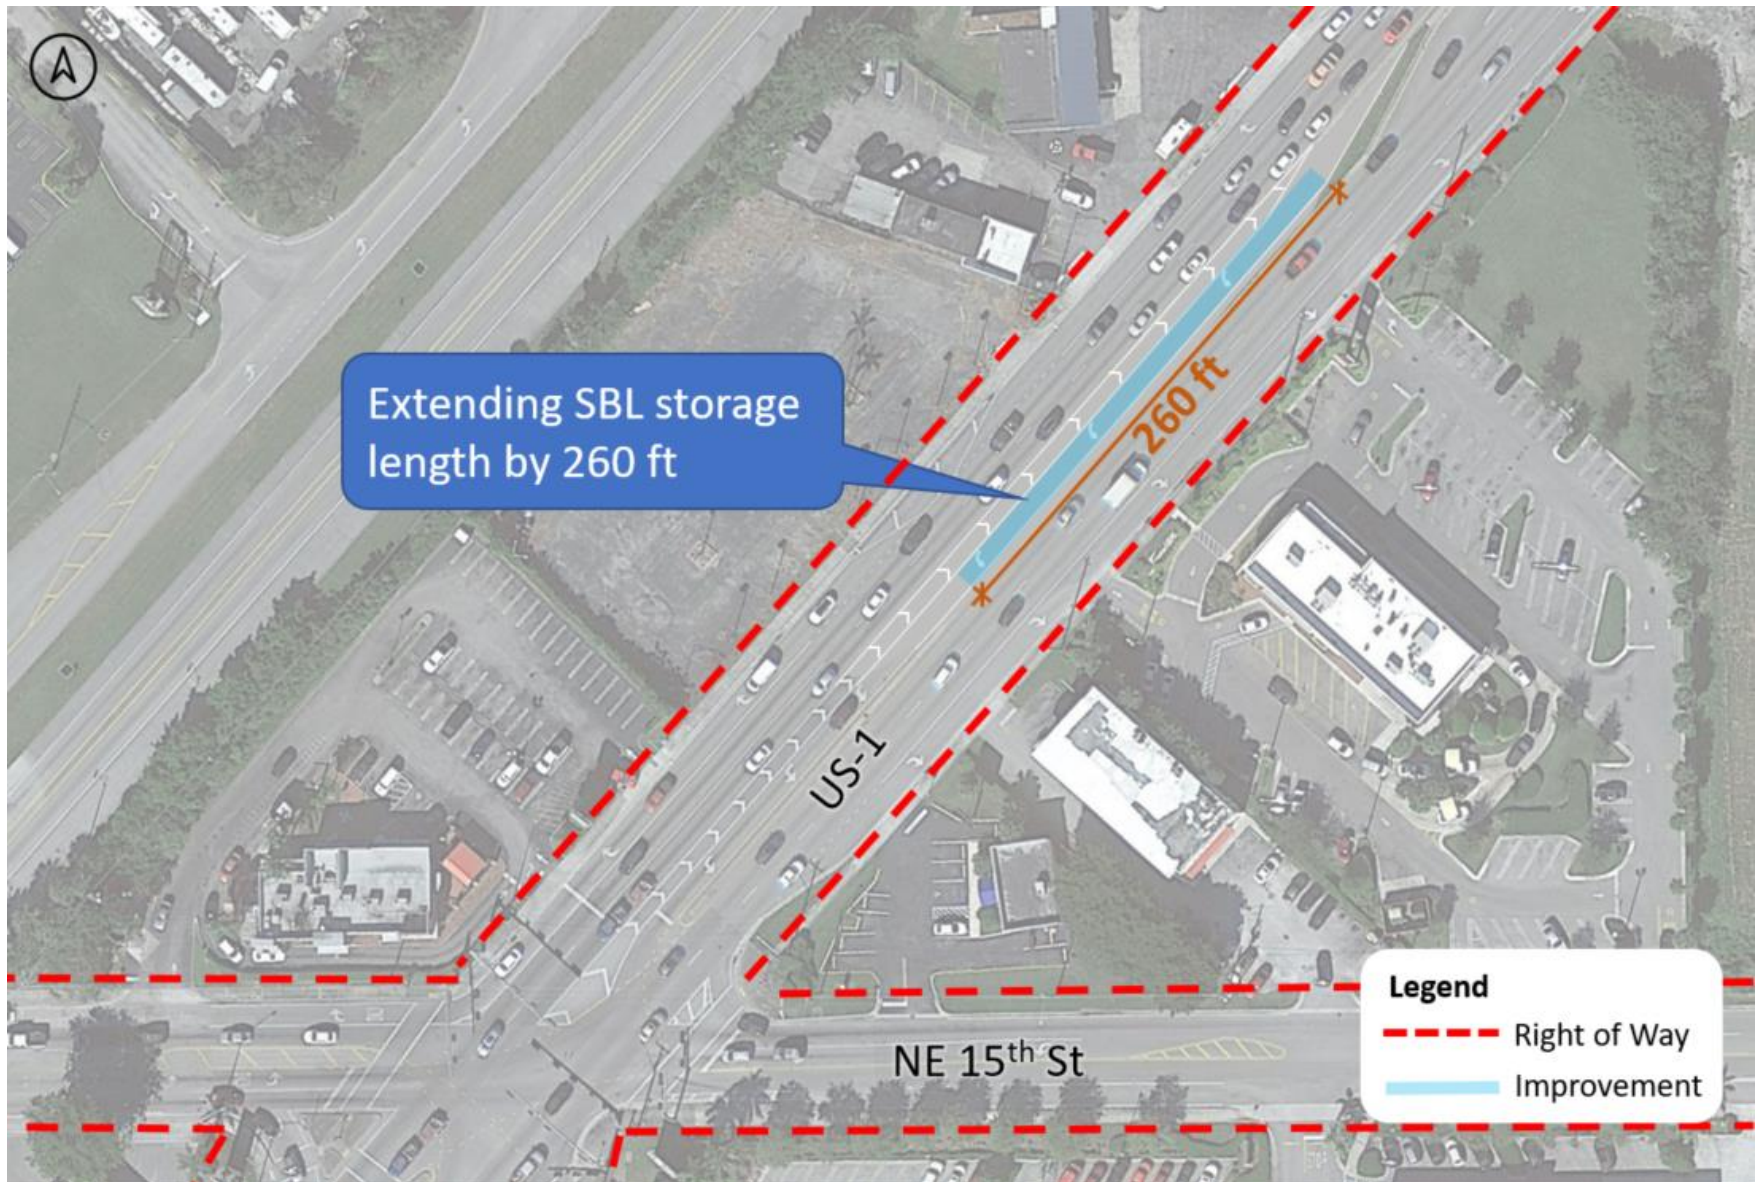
Conceptual Design Plan – US-1 and NE 15th Street/NE 12th Avenue
